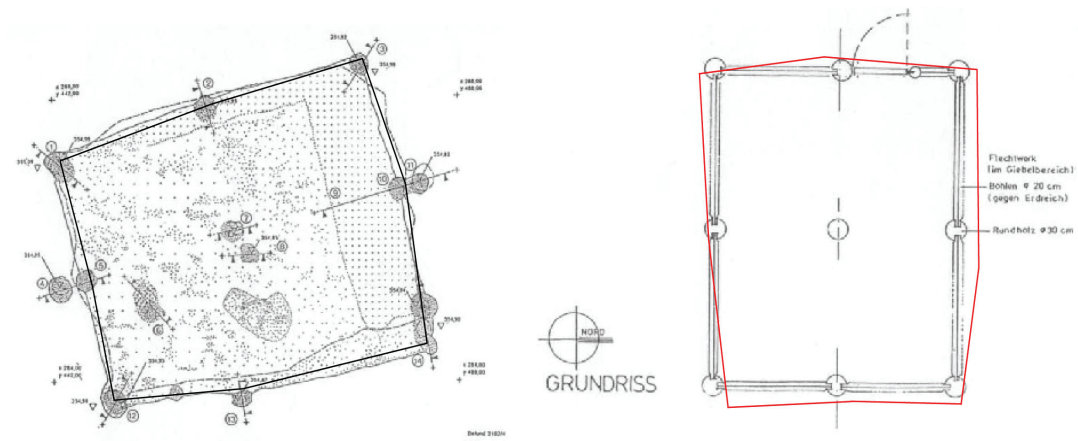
House at Hochdorf (Germany) with reconstruction. The dark outline shows the original pit contour. After Bader 1999, 230 fig. 12.
